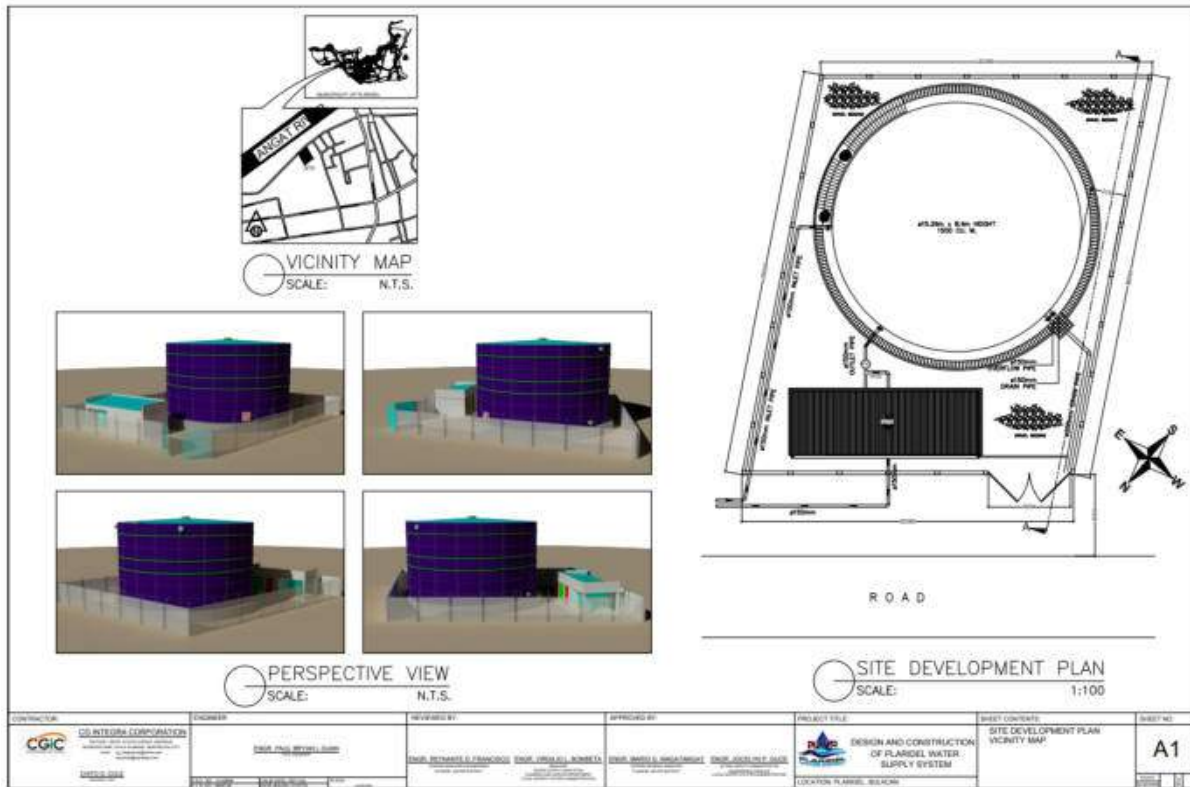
Site Development Plan of Ground Reservoir in Barangay Rueda
